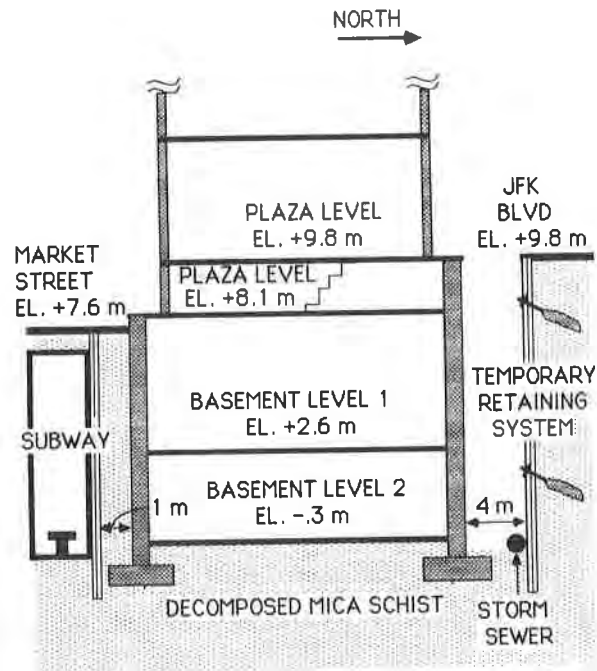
CROSS SECTION THROUGH PLAZA DURING CONSTRUCTION
